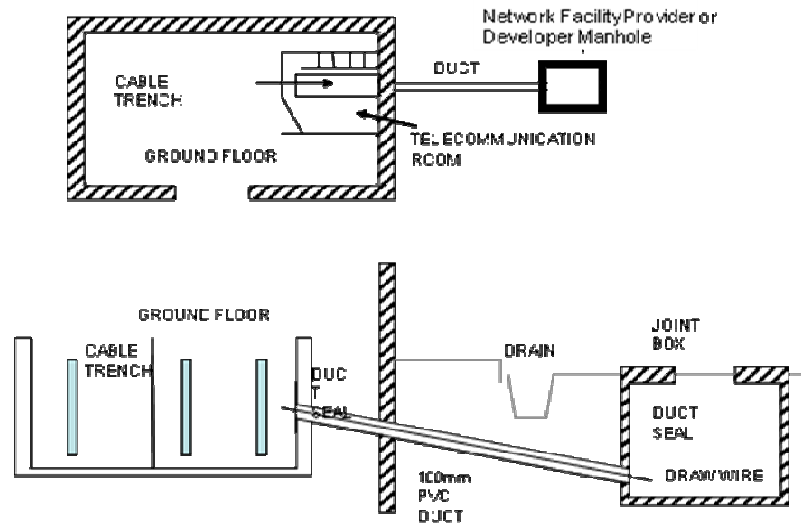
Duct Route into Building Telecommunication Room on Ground Floor
